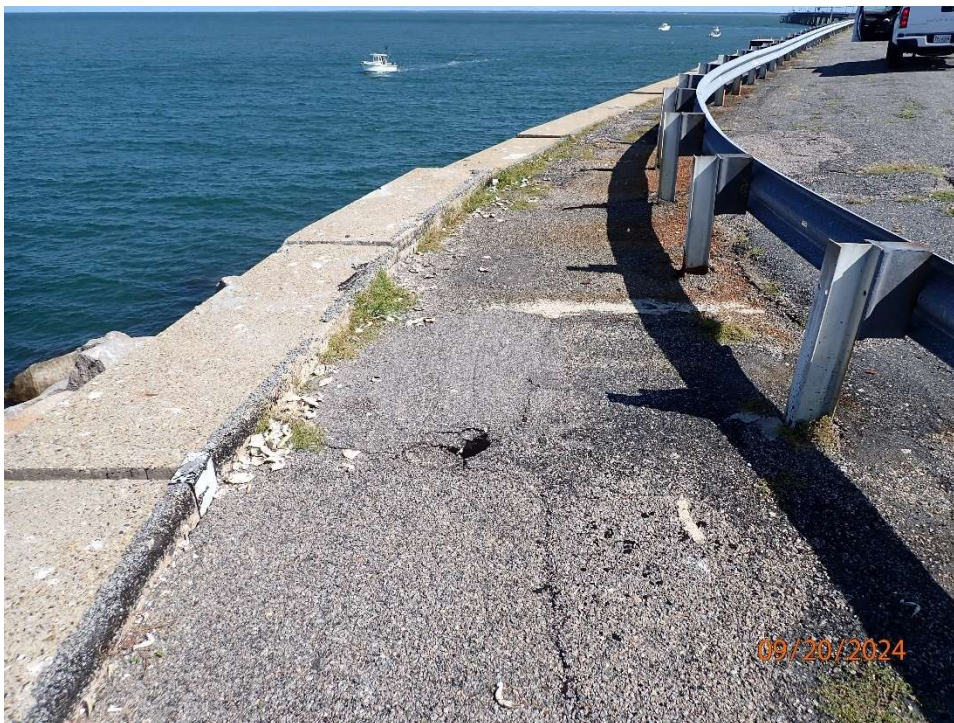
Portal Island 4 Splash Wall; newly forming sinkhole behind guardrail on west side of island. Depth of sinkhole could not be verified.
